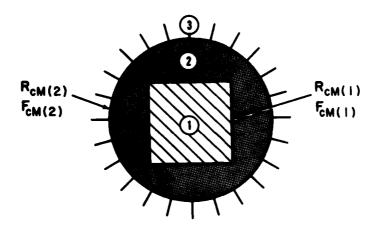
Set-up for equal strength calculation: 1 - piling, 2 - frozen soil solution, surrounding frozen soil.
